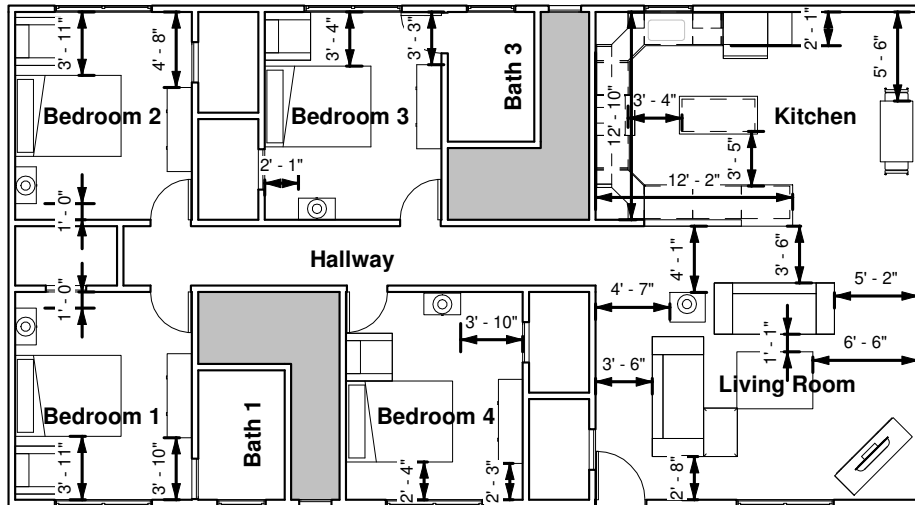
Dimensioned layout of bedroom, kitchen, and living room fuels.
